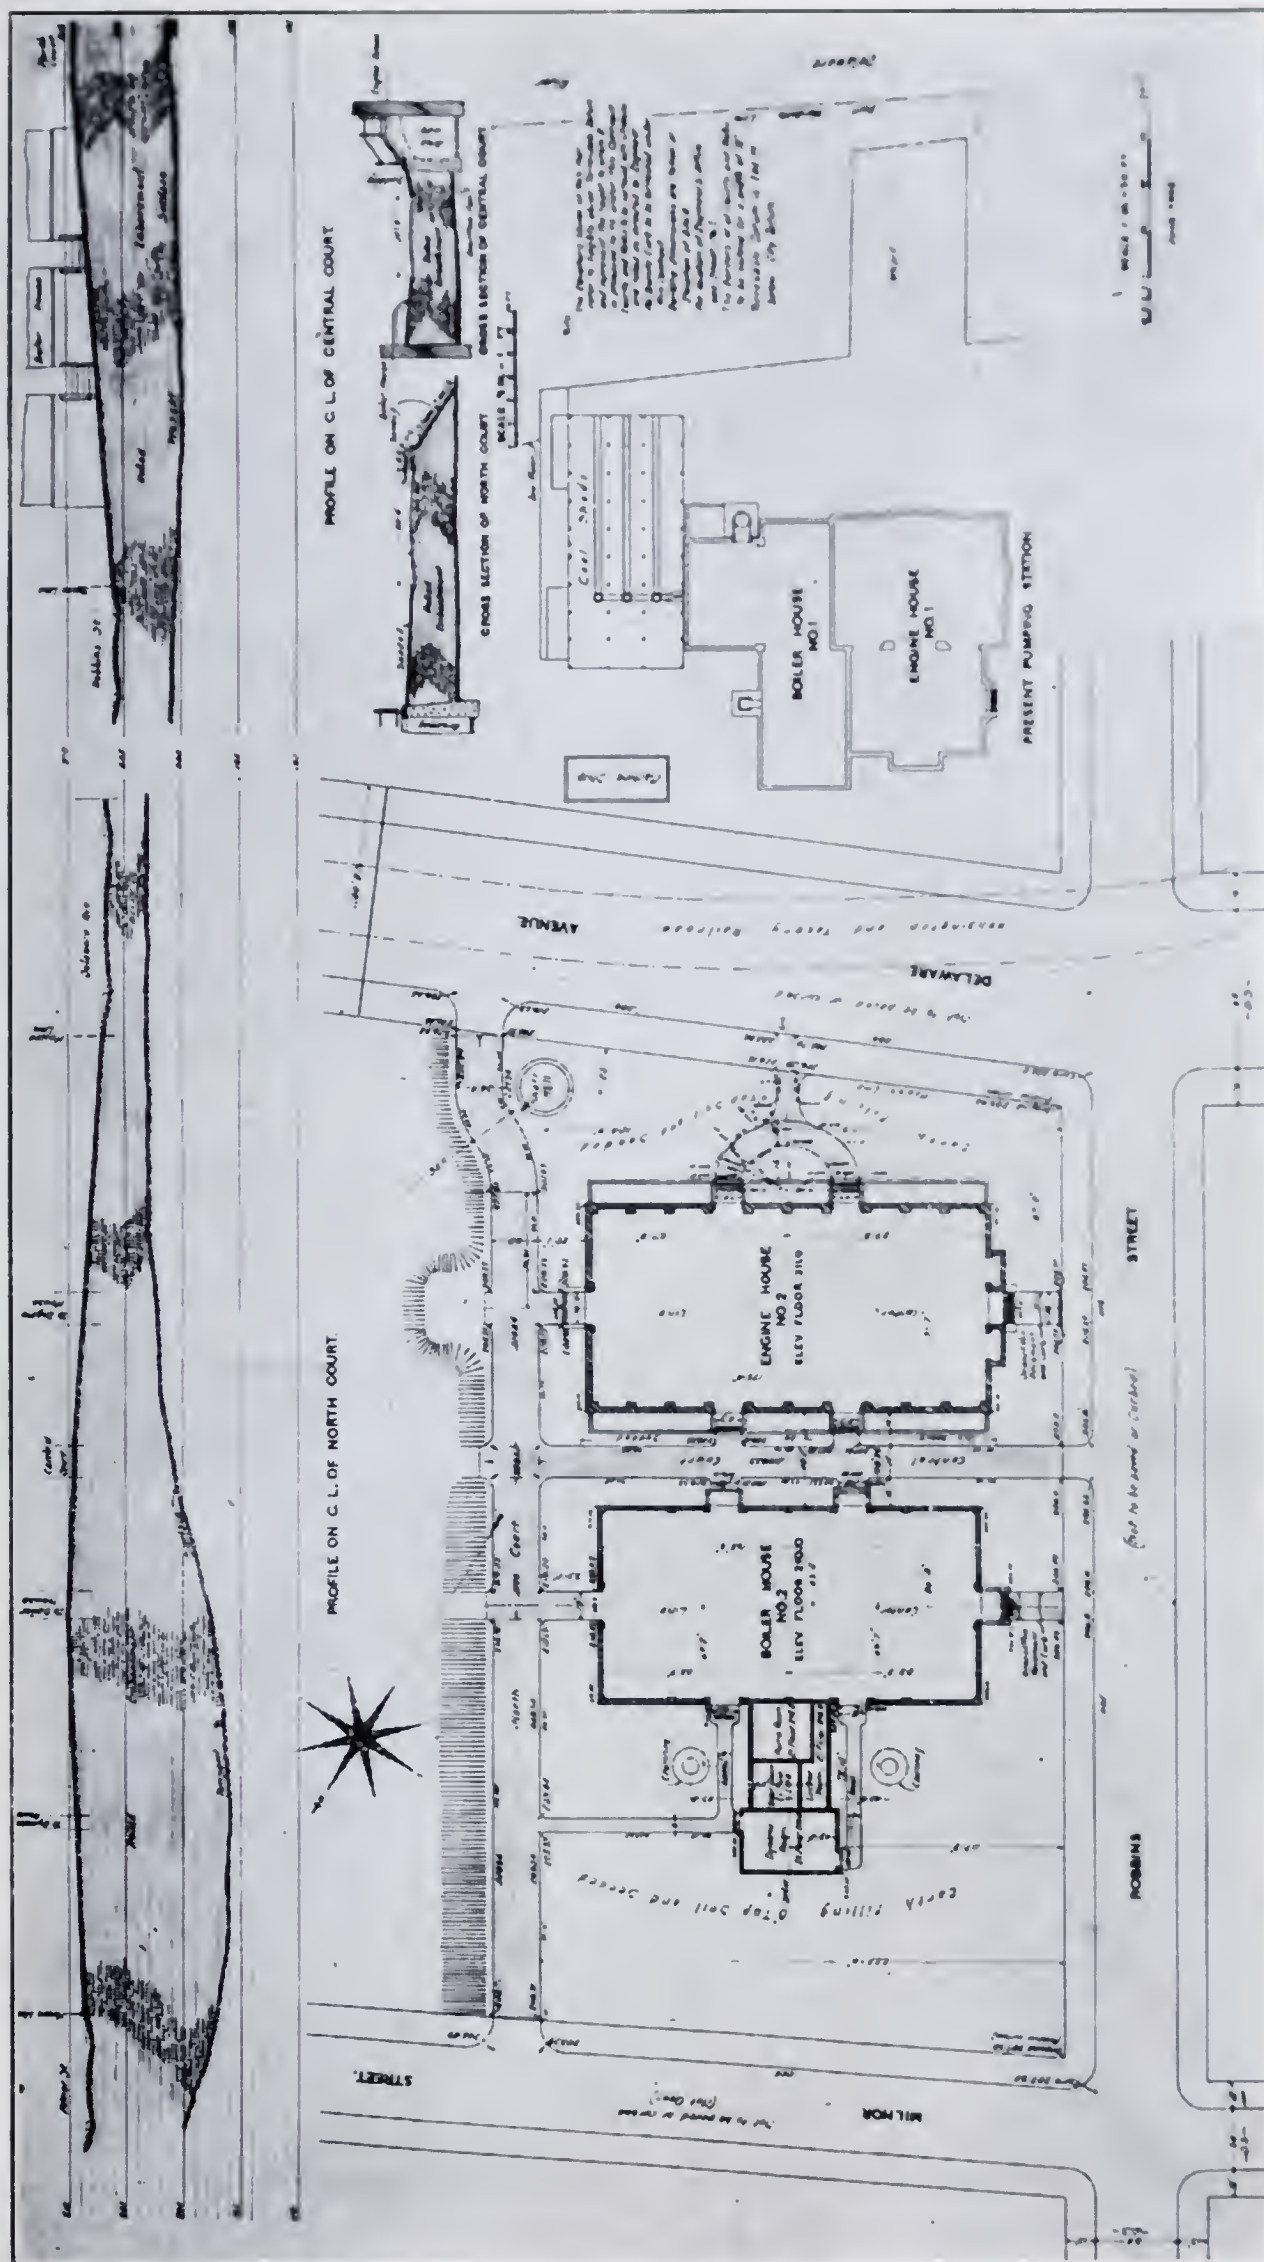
LANDNER'S POINT PUMPING STATION—PLAN OF BUILDINGS AND COURTS.
